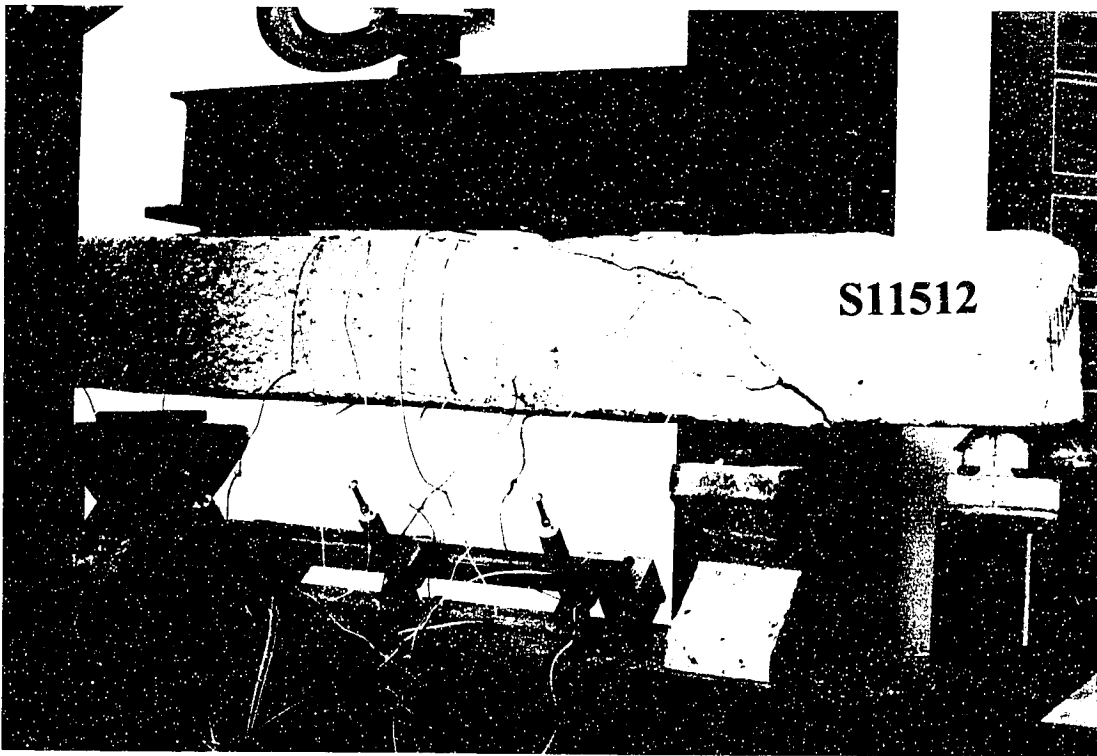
Photograph showing the mode of failure for beam S11512 strengthened by 1 mm thick, 100 mm wide and 900 mm long plate with 120 mm c/c spacing of stirrups
